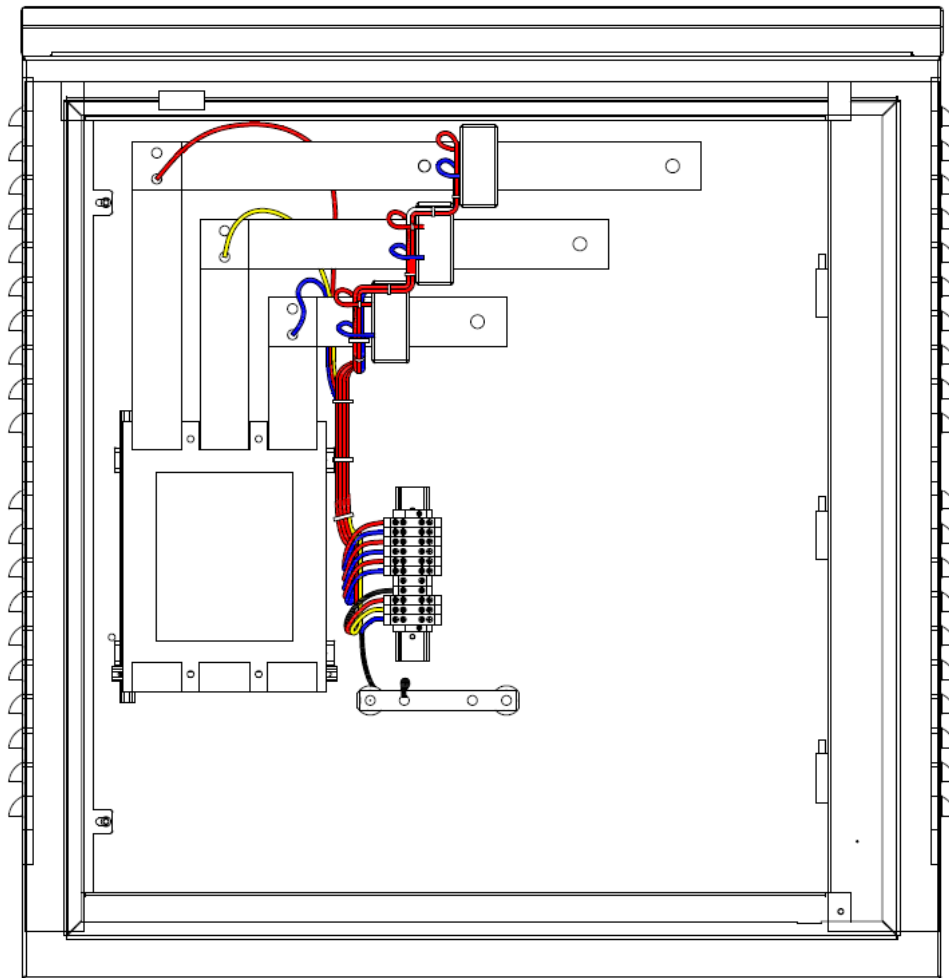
Perspective Drawing of the Service Cabinet with Enclosure Main Door & Dead-Front Inner Door Opened
